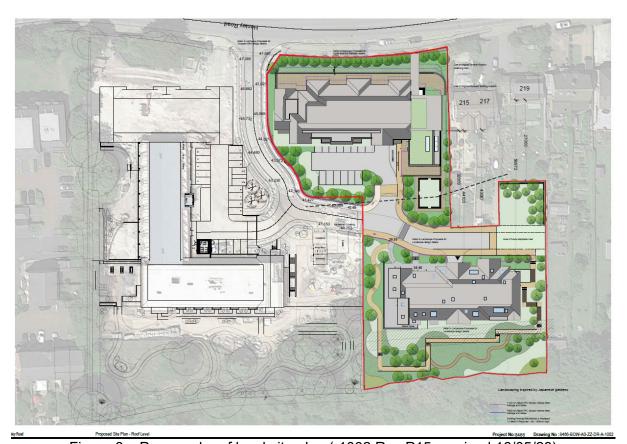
Proposed roof level site plan (-1002 Rev P15 received 16/05/23)
